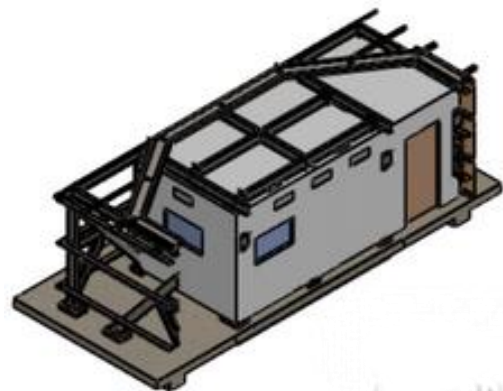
Steel structure of the shelter and control cubicle inside the shelter.
